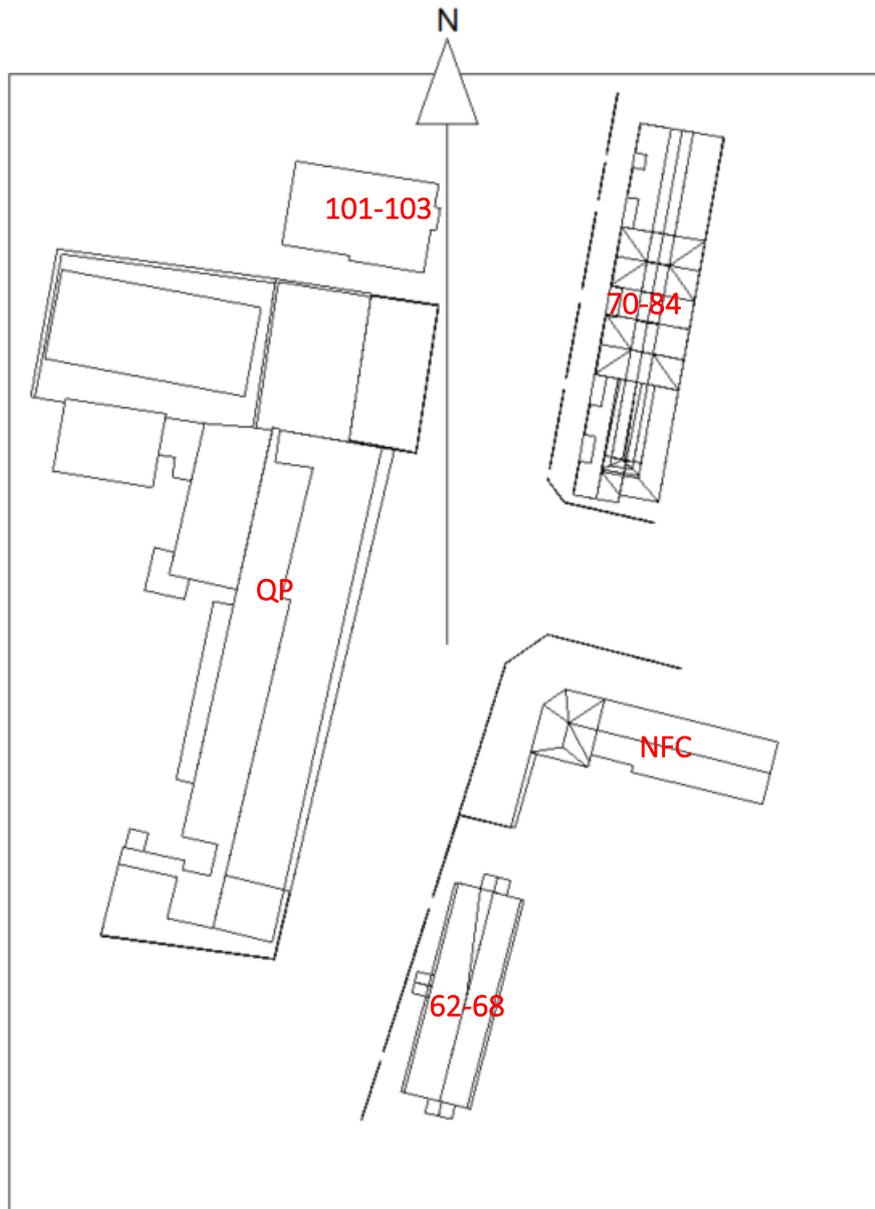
Site plan showing orientation of building model – note existing & proposed are overlaid
